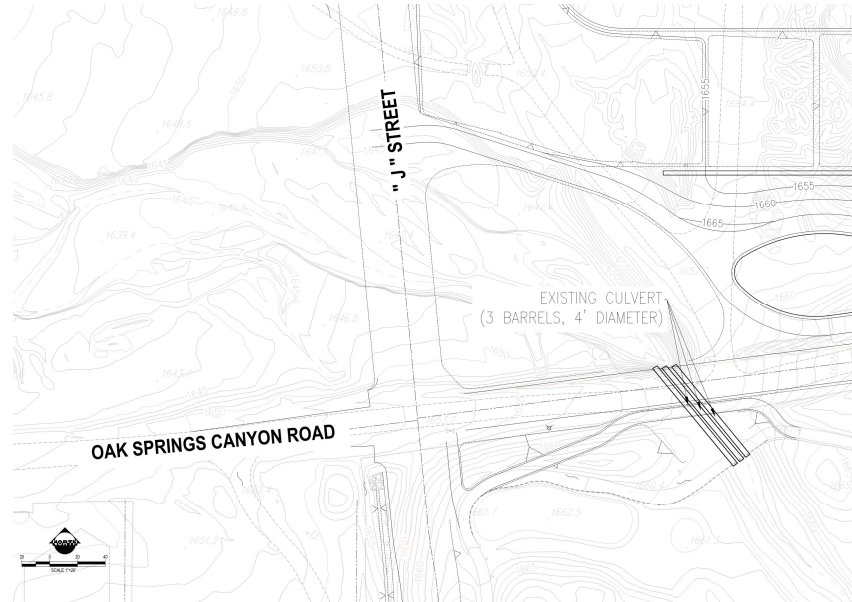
Existing Oak Springs Canyon Road Culvert and Future J Street
